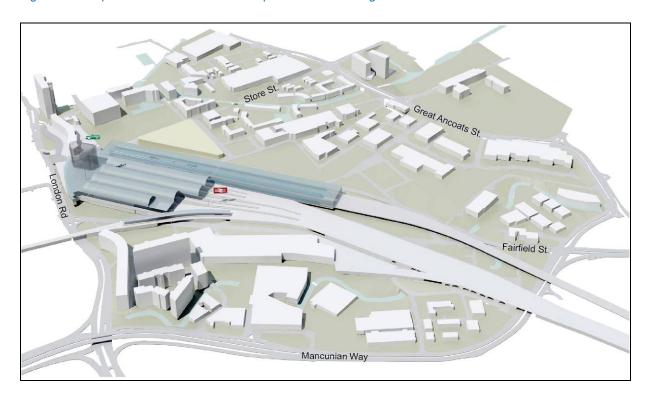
Option 1a – Birds Eye View Of Proposed Station Arrangement
